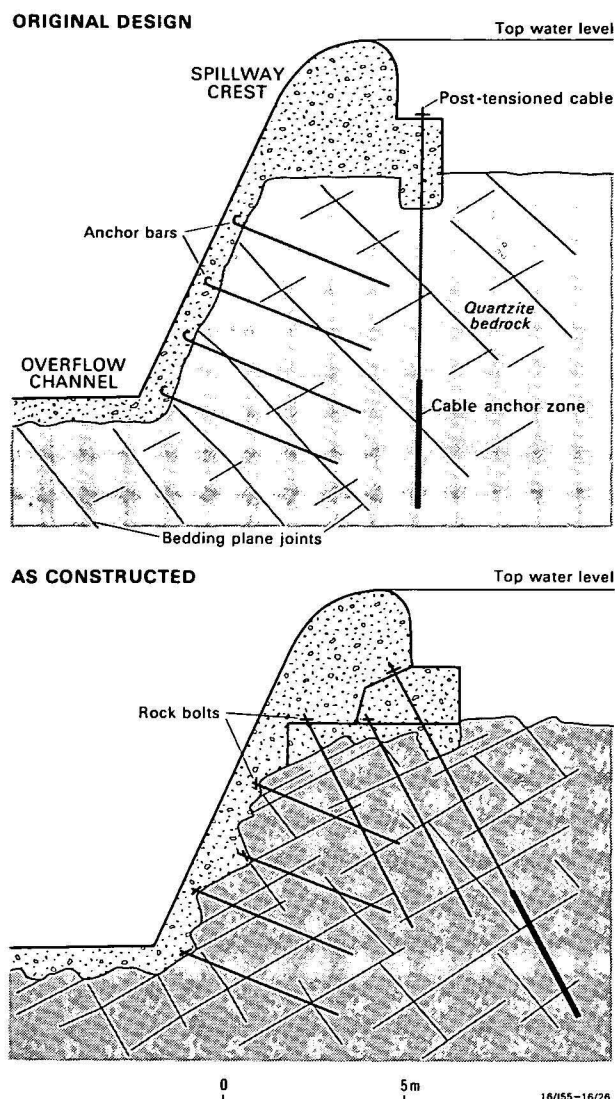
Sections through the spillway crest, showing the original design and design as constructed.
